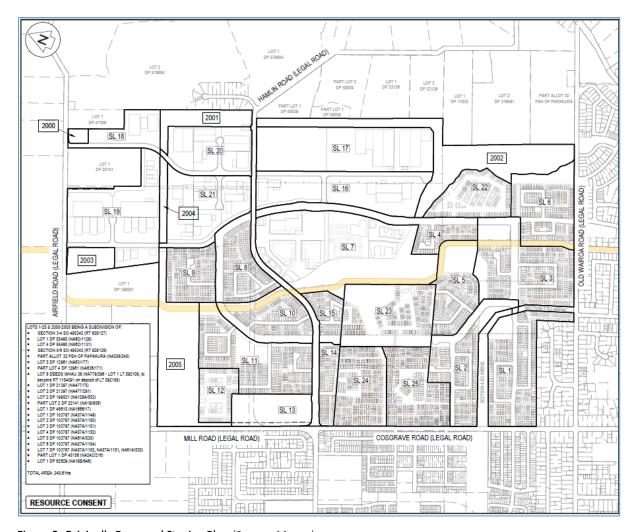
Originally Proposed Staging Plan (Source: Maven)
